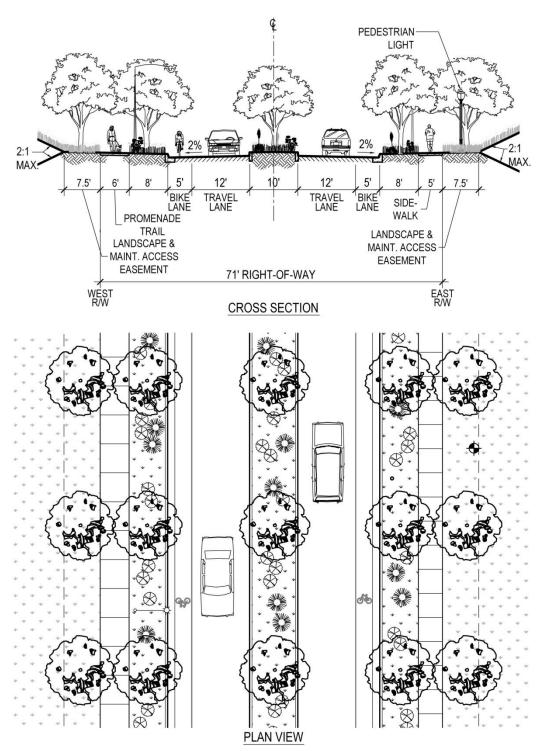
Modified 2-Lane Secondary Village Entry (Santa Maya)
